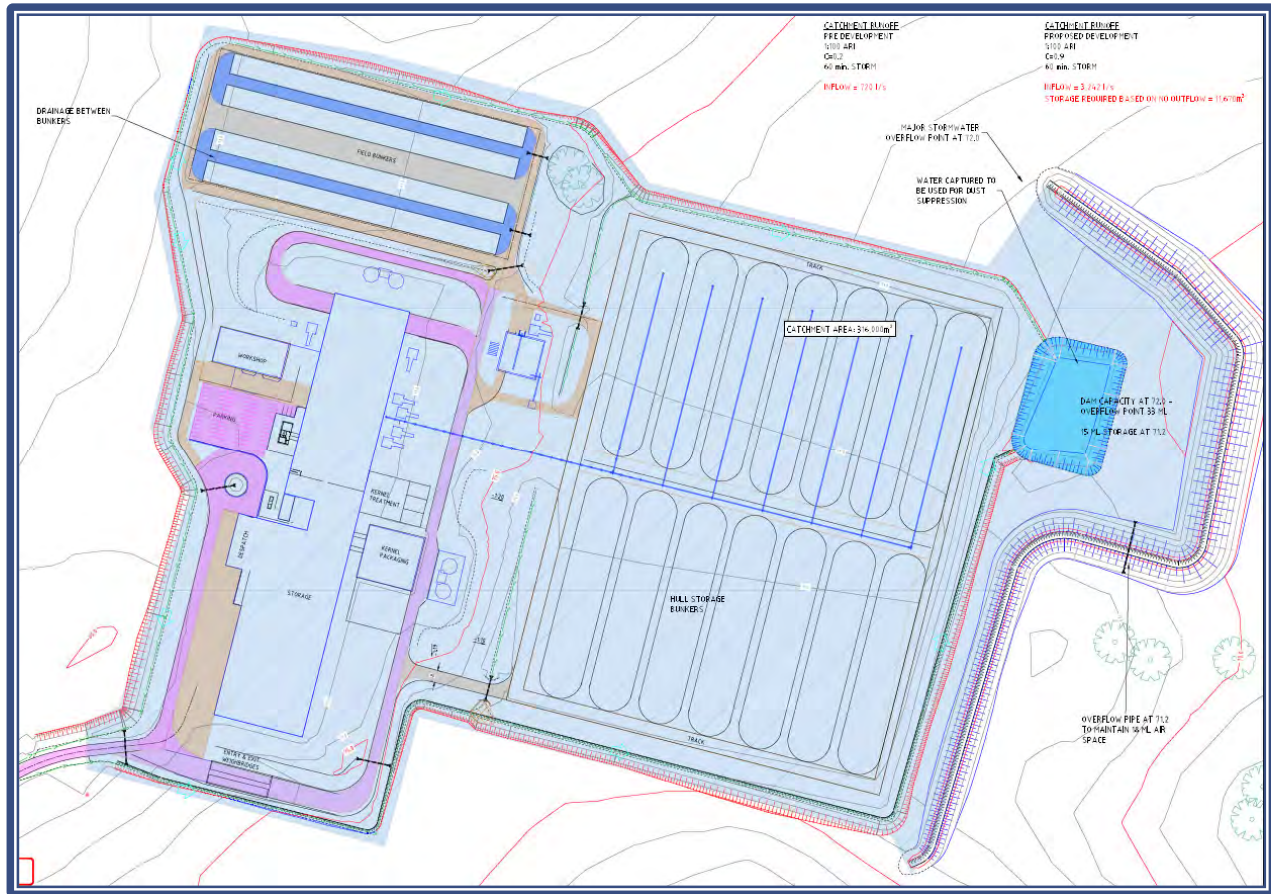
Site slope and drainage (Source: Price Merrett Plan Sheet 10)
